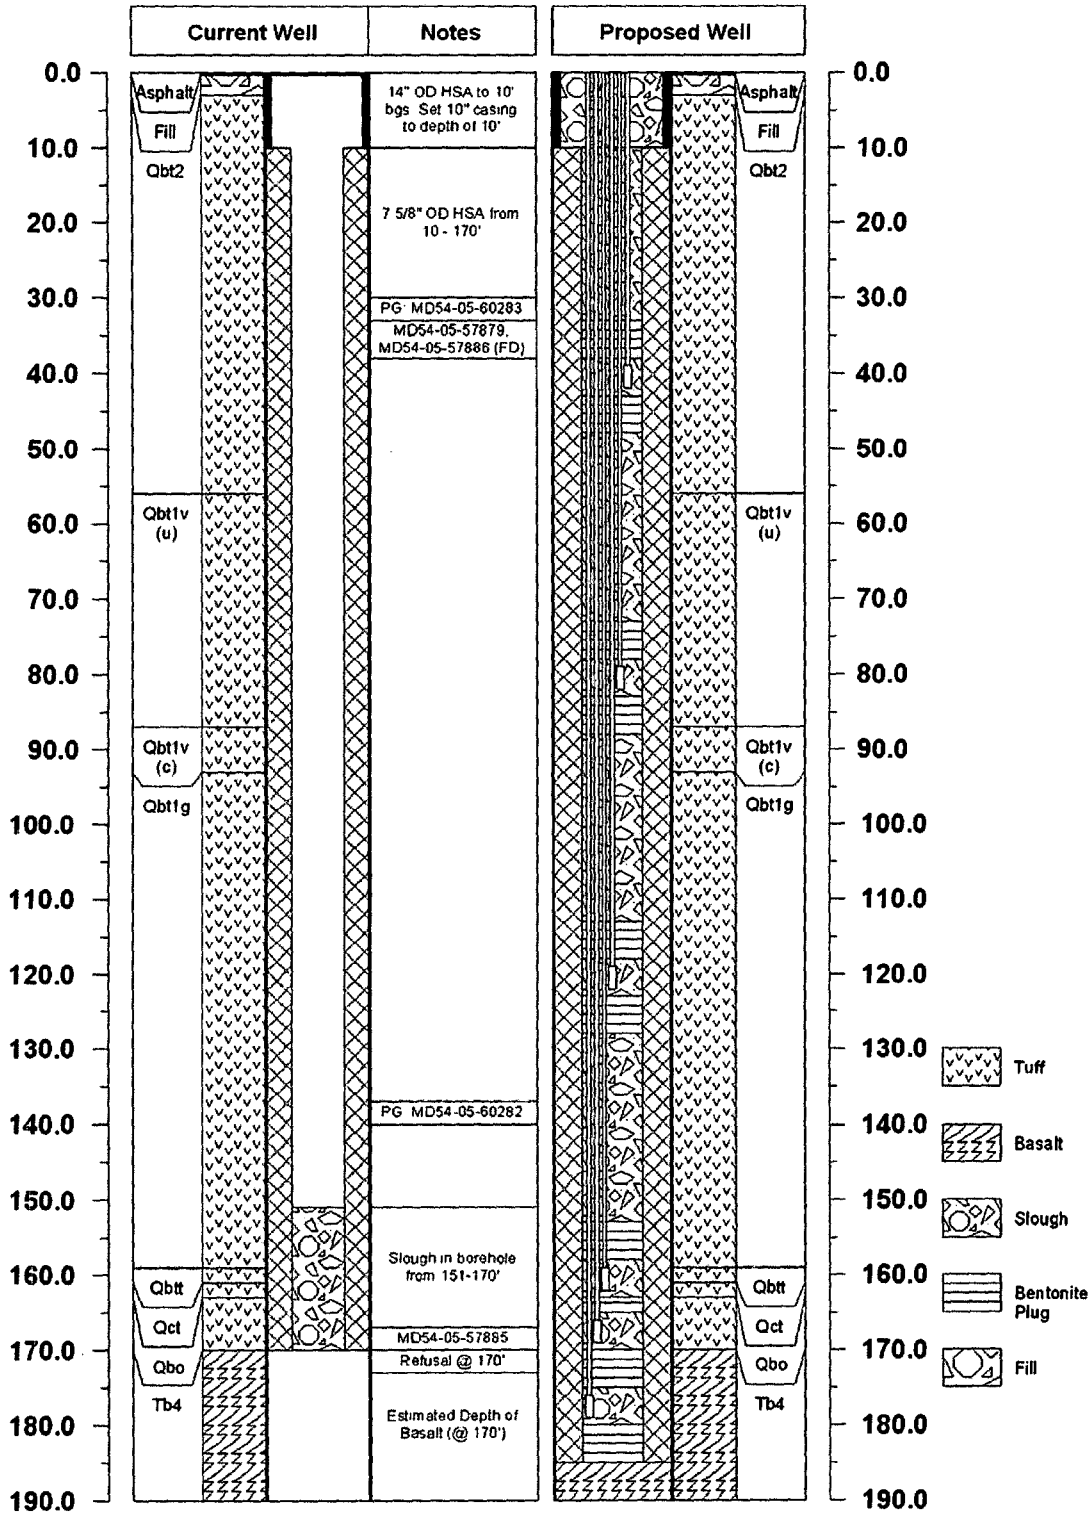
Detail of proposed borehole construction for BH-2, 54-24361
